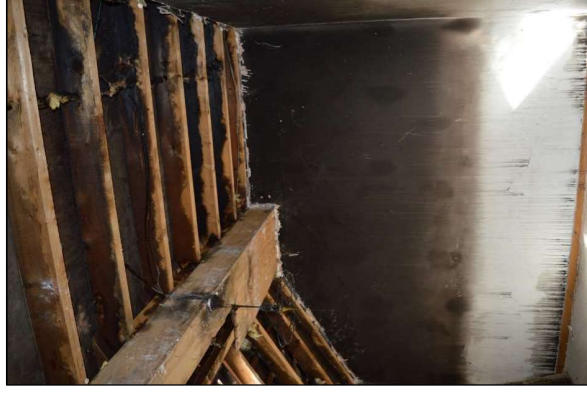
Fire damaged bedroom 4 (CPAT 4900-0042)
